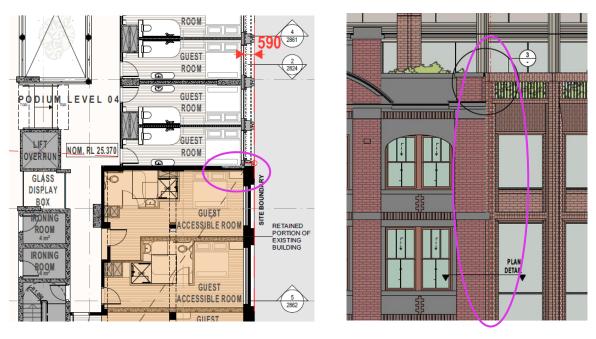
Proposed Level 4 Floor Plan (left) and East Elevation (right)
